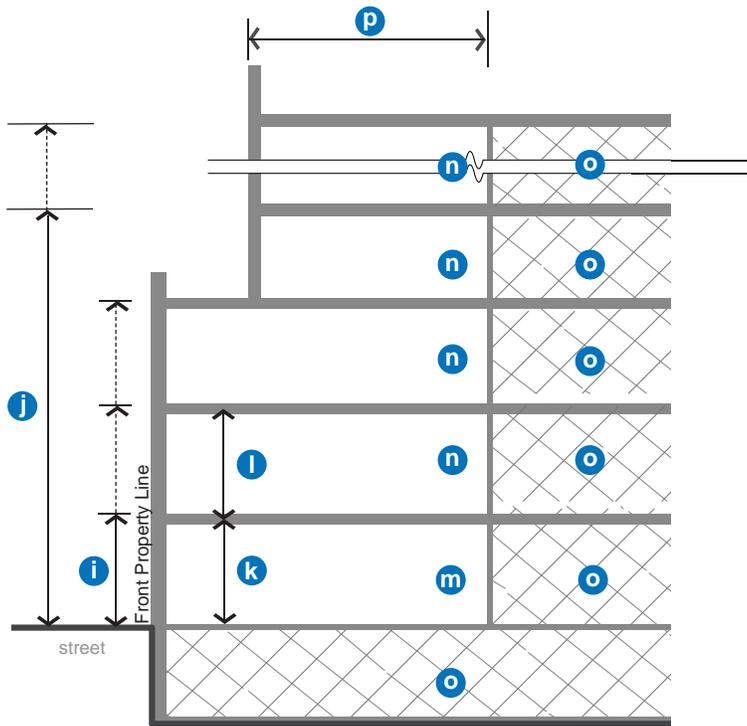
(2) Storefront Building: Height and Use Requirements
